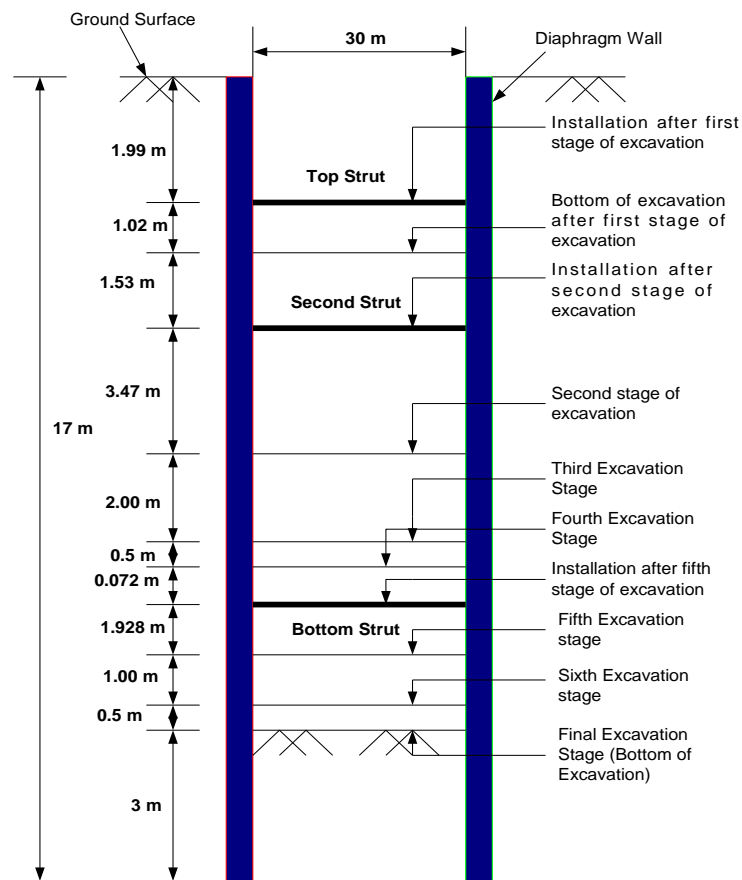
Construction sequence and a cross section of a typical braced excavation at a site in central Kolkata
